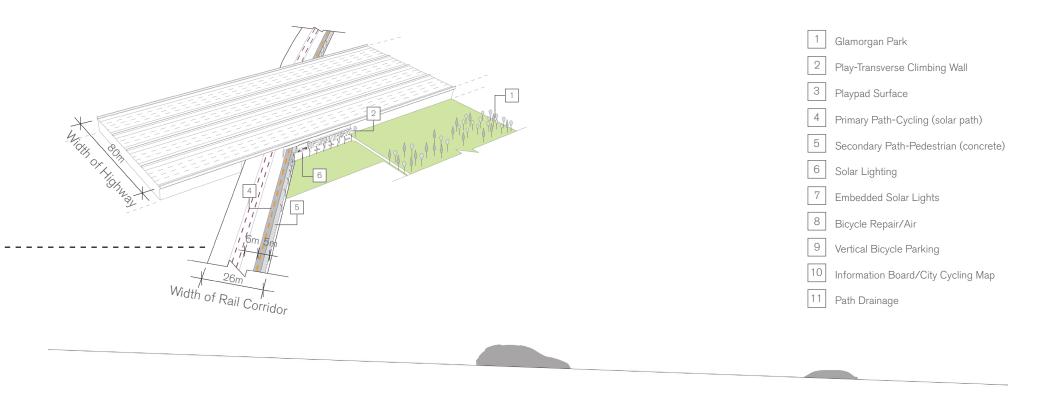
A wall provides separation between the existing and proposed infrastructure and folds to become a vertical public amenity (transverse climbing wall) and commuter cycling repair hub.
